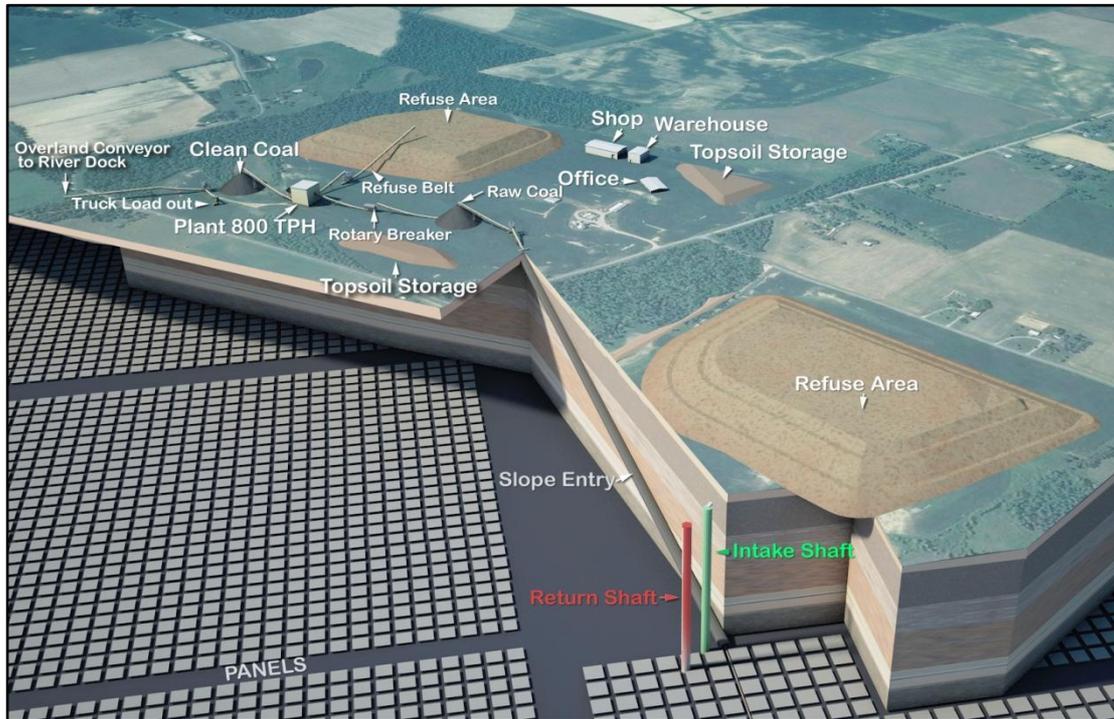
Conceptual Buck Creek Project Underground Mine Plan and Surface Facilities
